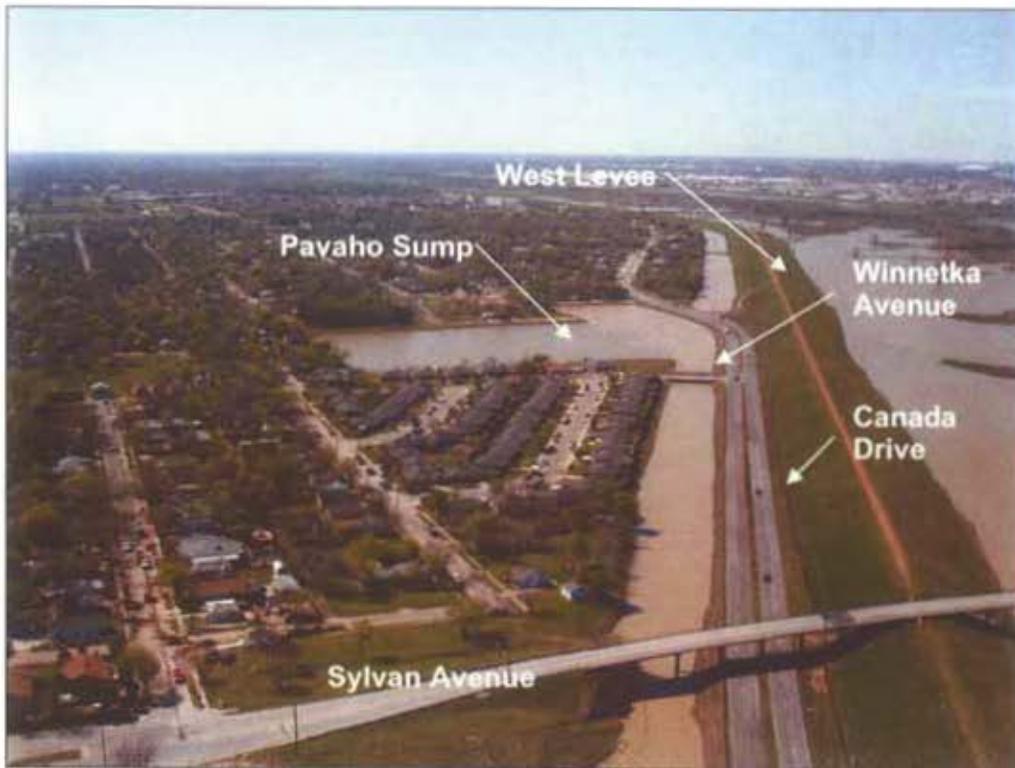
Pavaho Sump, Looking West – March 21, 2006
